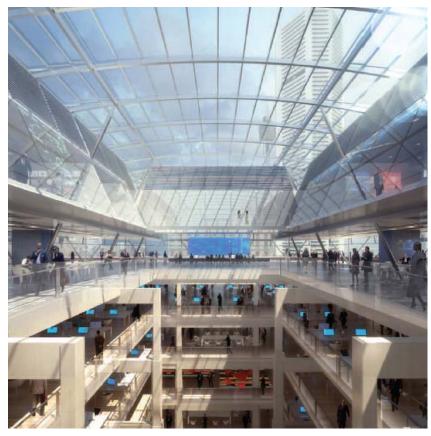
Proposed enlarged atrium (note: existing columns and beams are retained)
